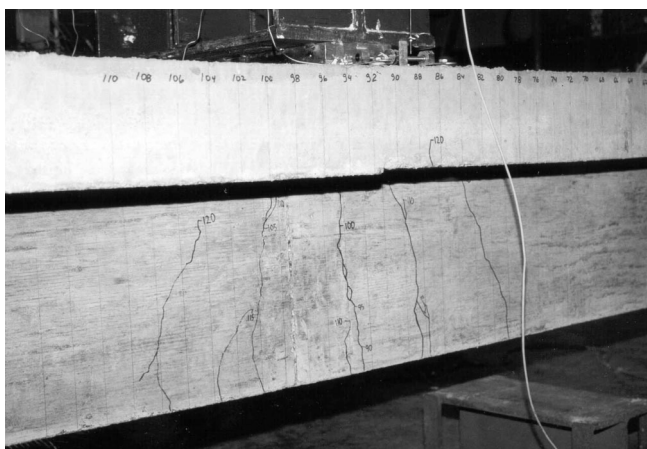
Multiple-strand development length specimen HPC-1 before failure (north face).
